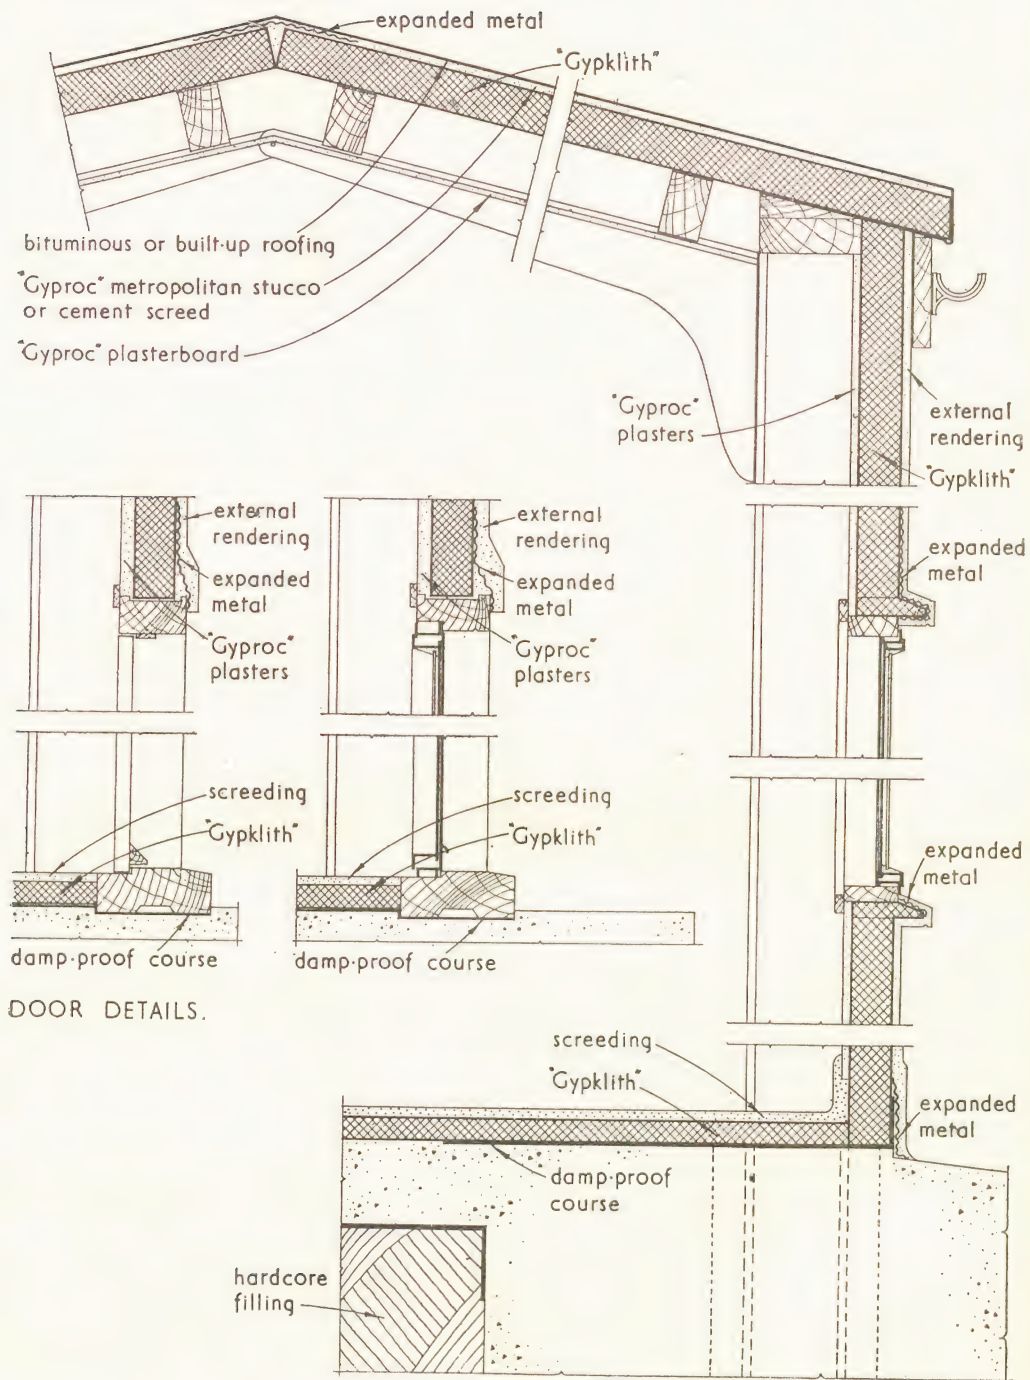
"Gypklith" slabs in pre-cast concrete framed building. 25 ft. span.
